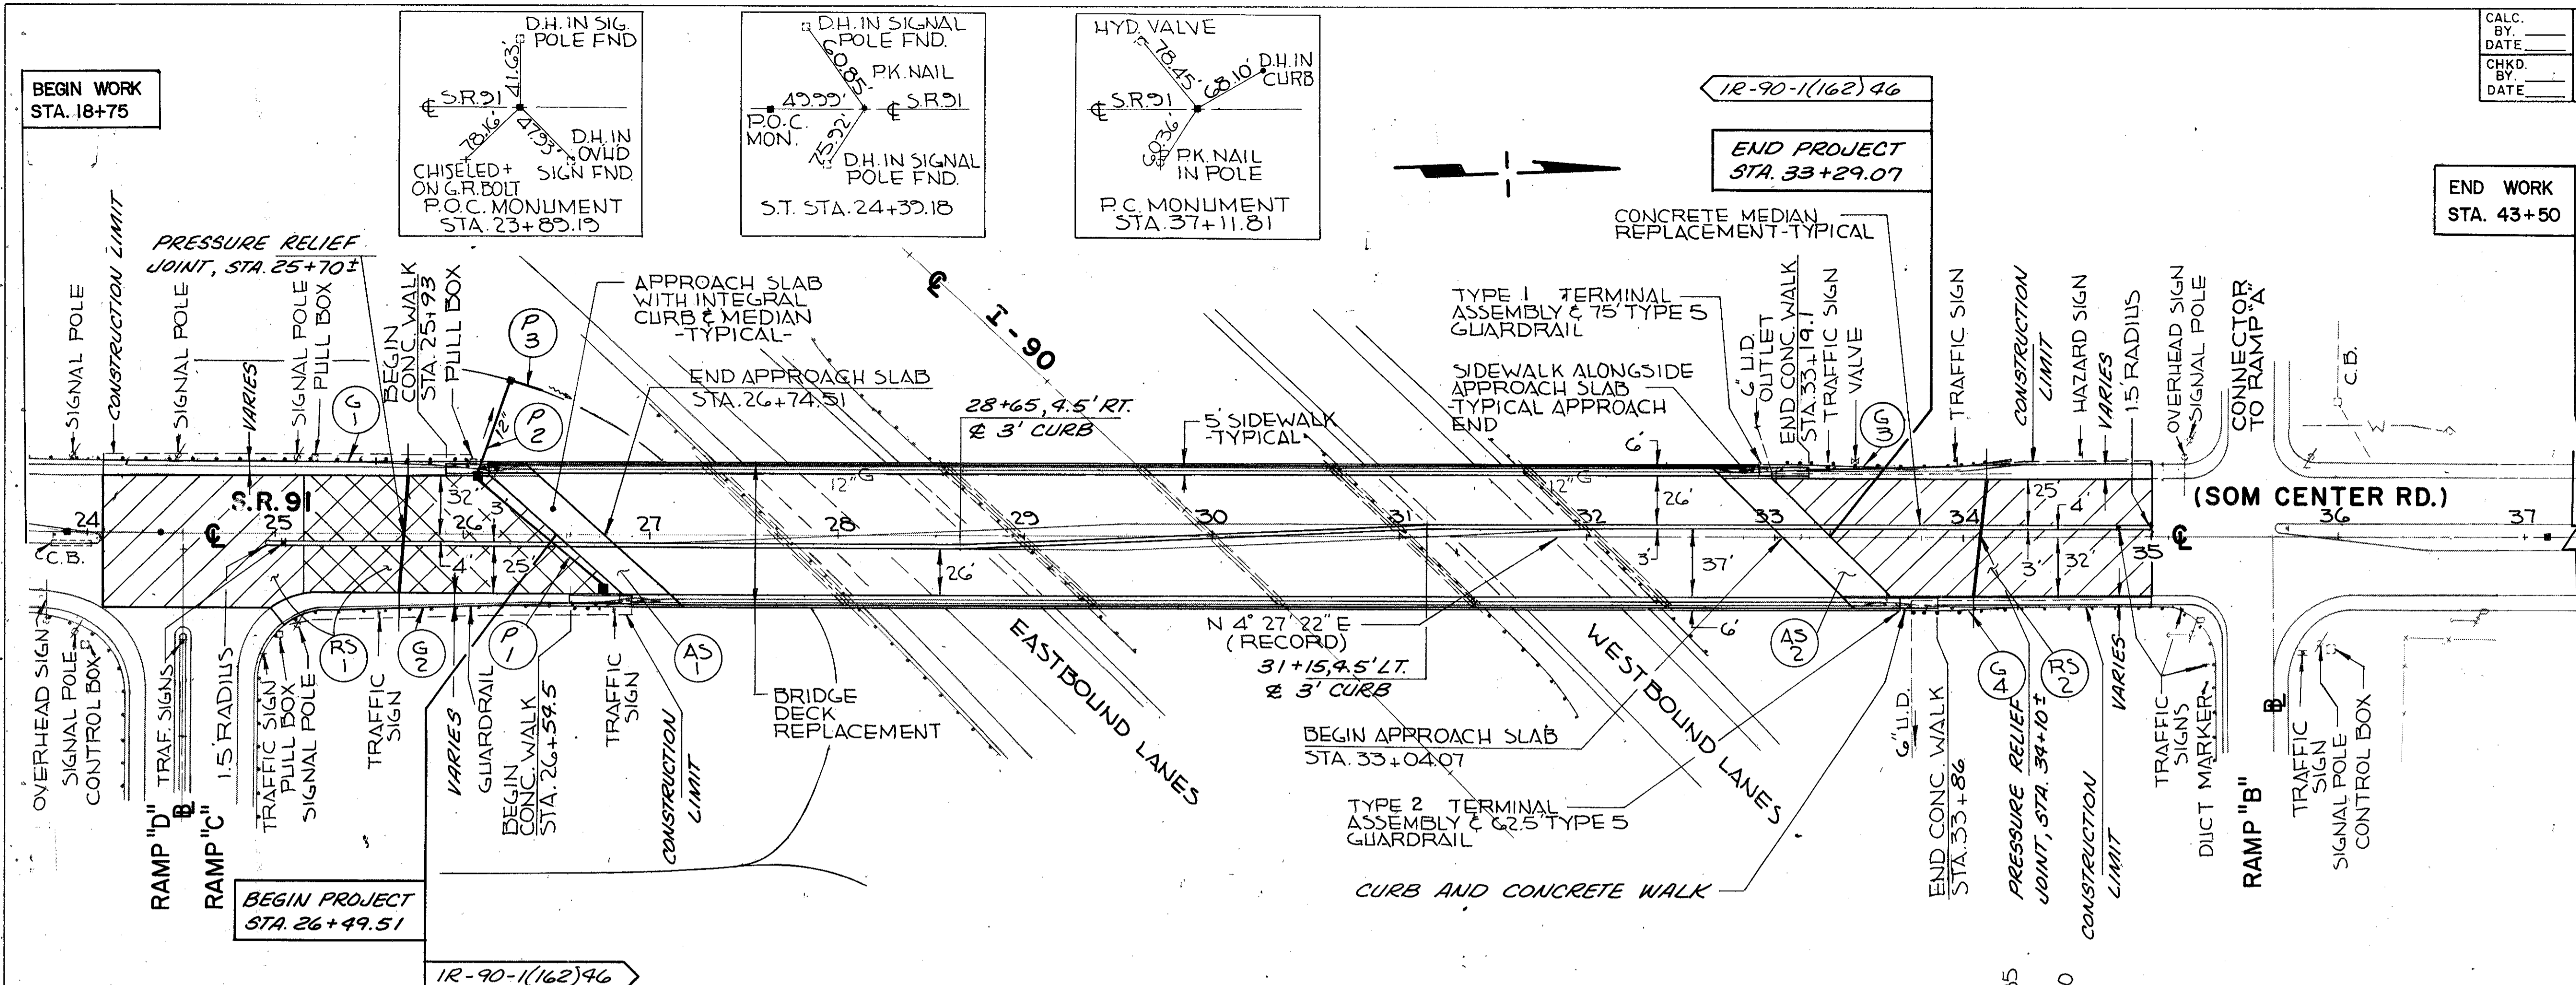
PLAN PROFILE - P.R. & T. STANDARD
